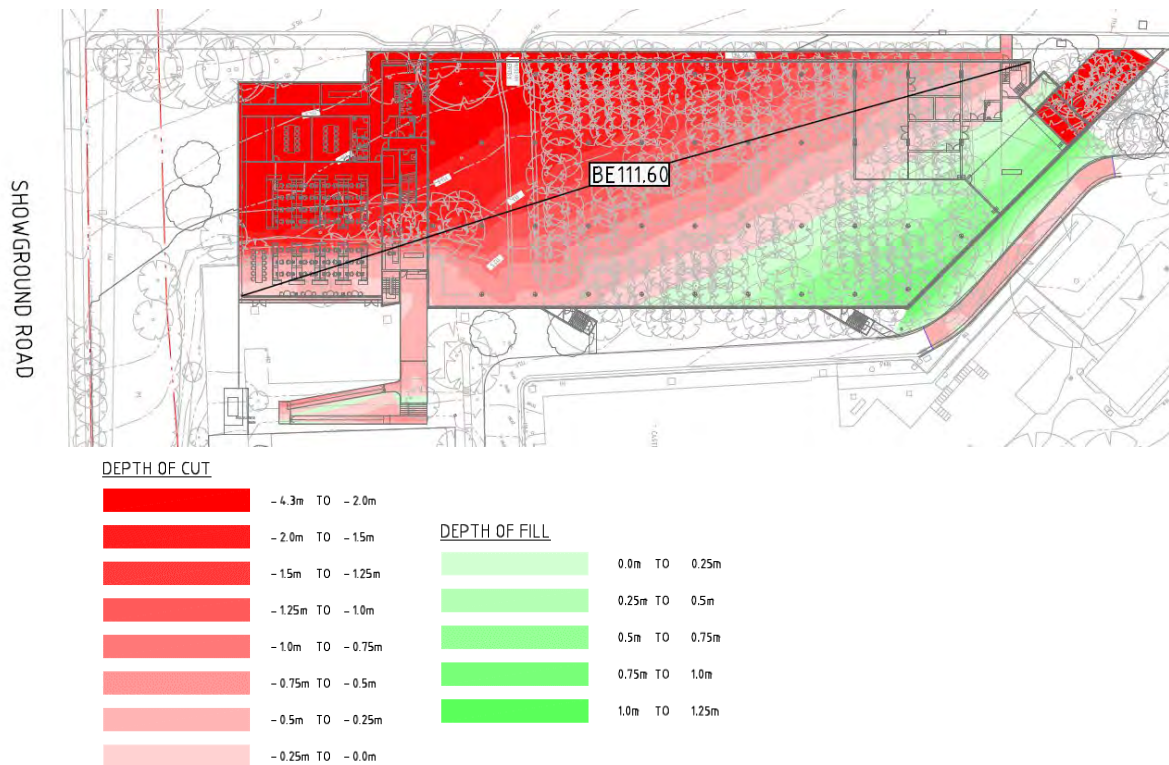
Bulk Earthworks Plan, oriented with west at top (Lahznimmo Architects, DA2.21, Rev.03, 22.07.2020)
